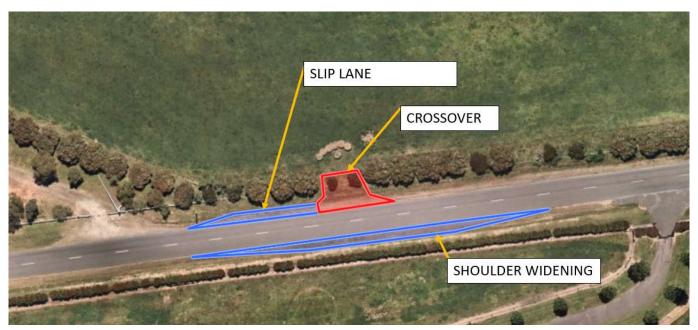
Likely roadworks at proposed Old Healesville Road entry
